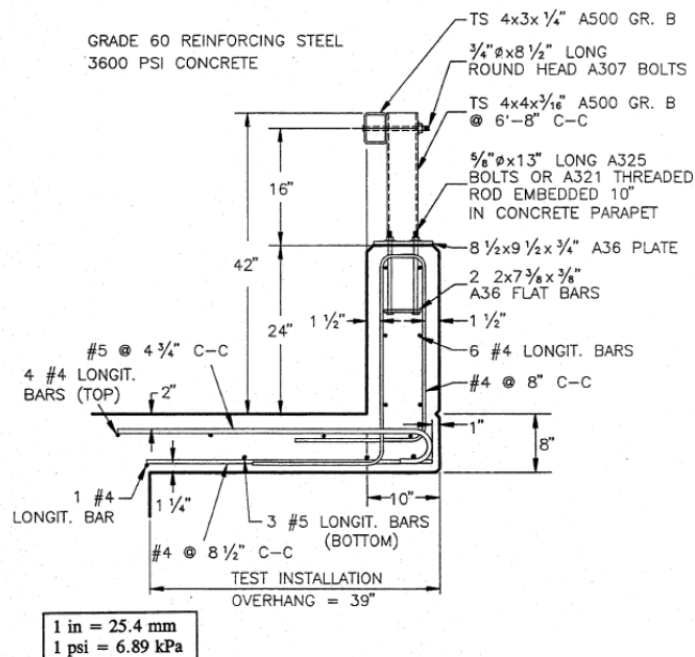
BR27C Design on concrete bridge deck and sidewalk.
